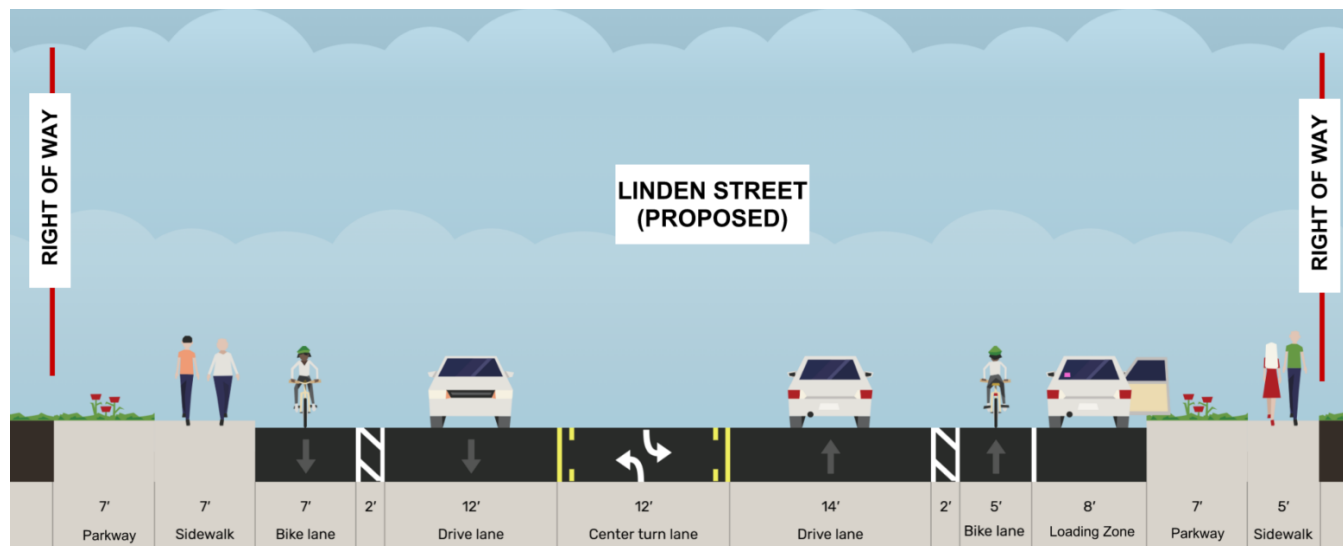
Proposed Roadway Cross Section and Lane Designations
